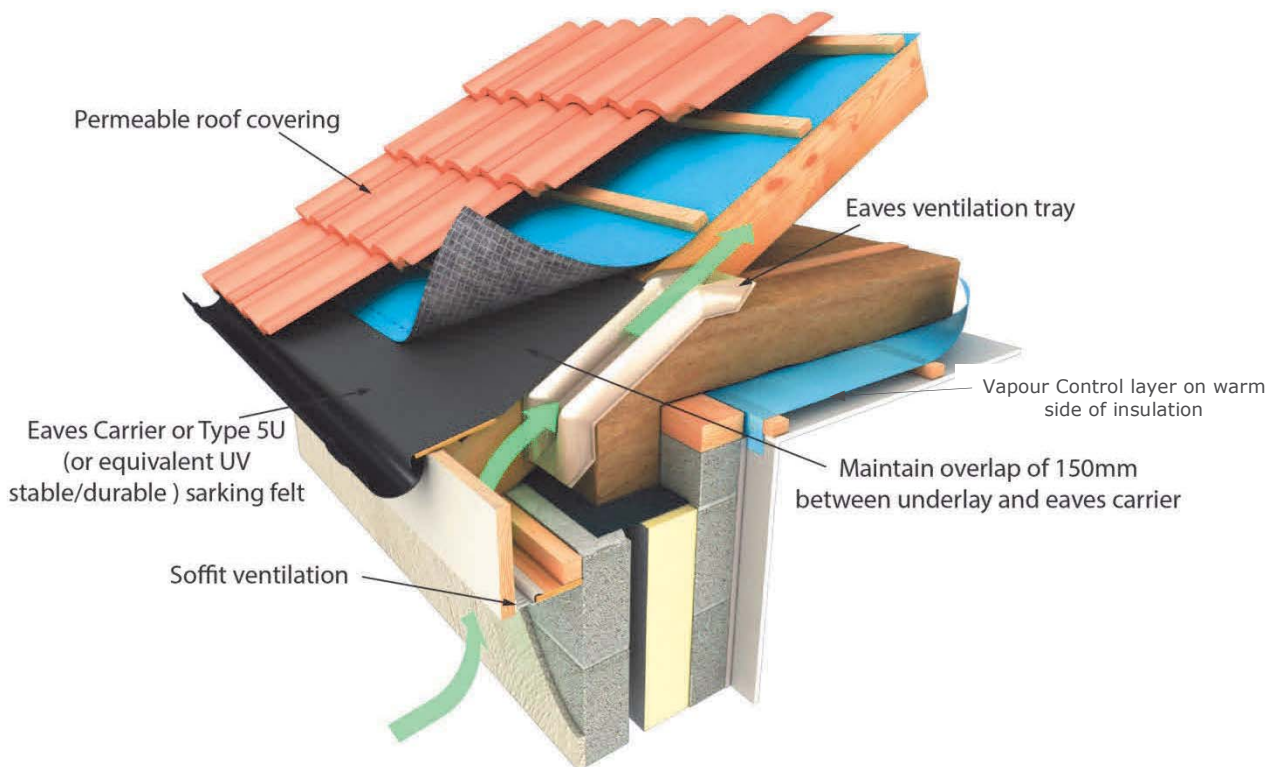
Cold Roof detail with permeable roof covering - Eaves Details
